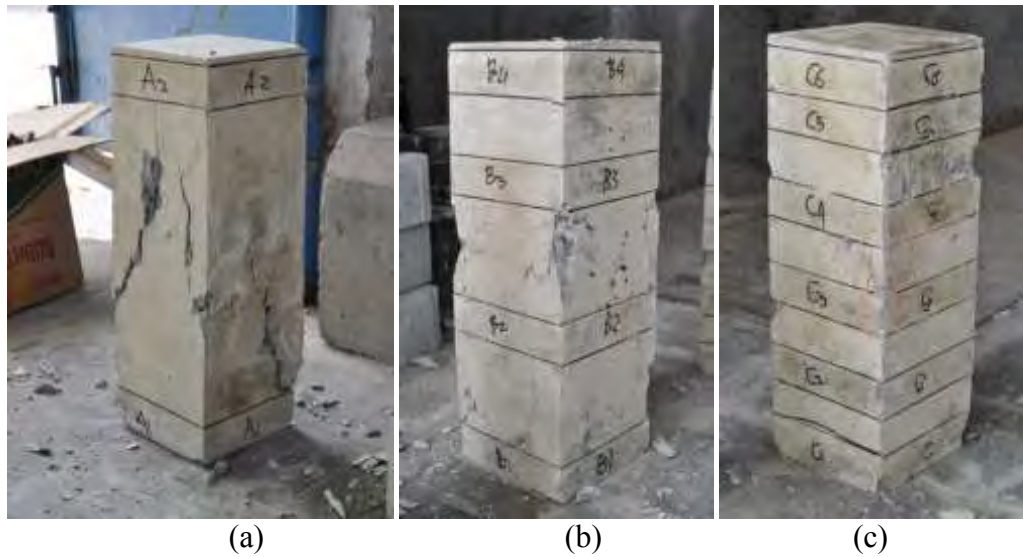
The damage patter of: (a) Column A, (b) Column B, and (c) Column C
